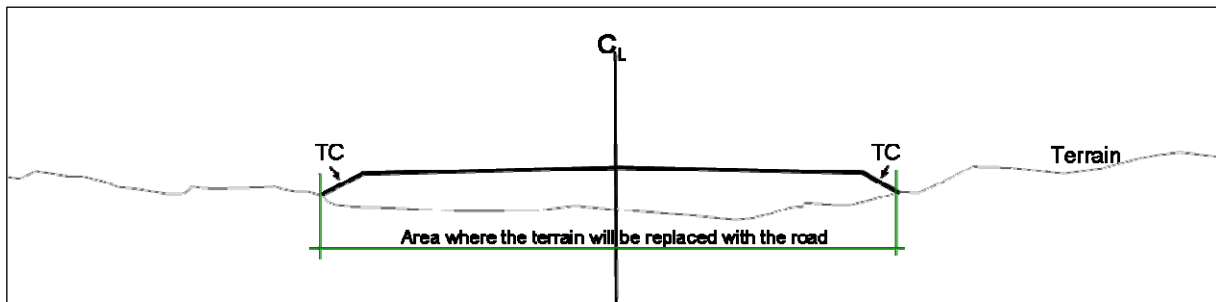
A cross-section showing how the new road surface will replace the existing terrain
